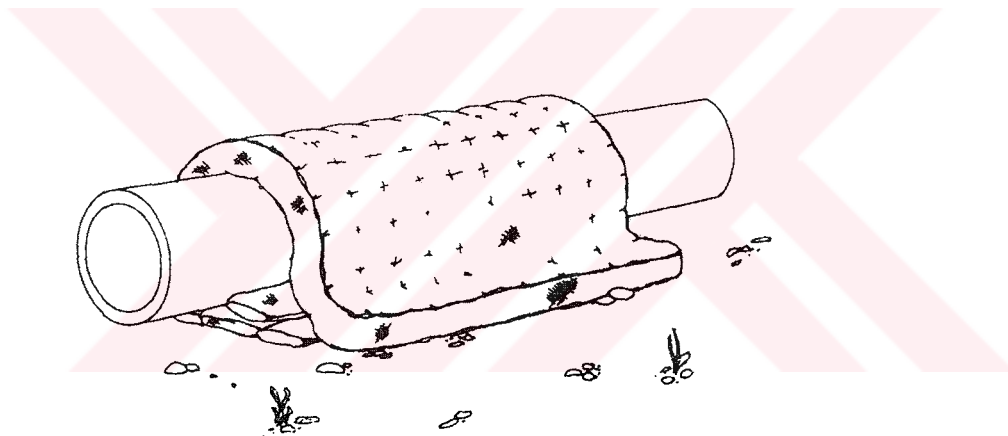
Grouting (protection) [Melegari&Bressan (1990)]
